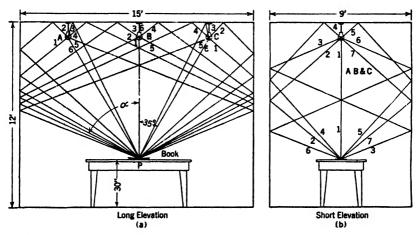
Side elevation (a), and end elevation (b), showing direct and reflected light from sources A, B, and C. Certain typical rays numbered 1, 2, 3, 4, 5, 6 leave the lamps and, after reflection from ceilings, walls, etc., finally illuminate the object on the table. Thus both direct and reflected rays add to the total light on the book. The average intensity in foot-candles is the sum of all rays emitted by the lighting unit *reduced* by the inverse-square of the distance and by the reflection factors of the ceiling and walls.
